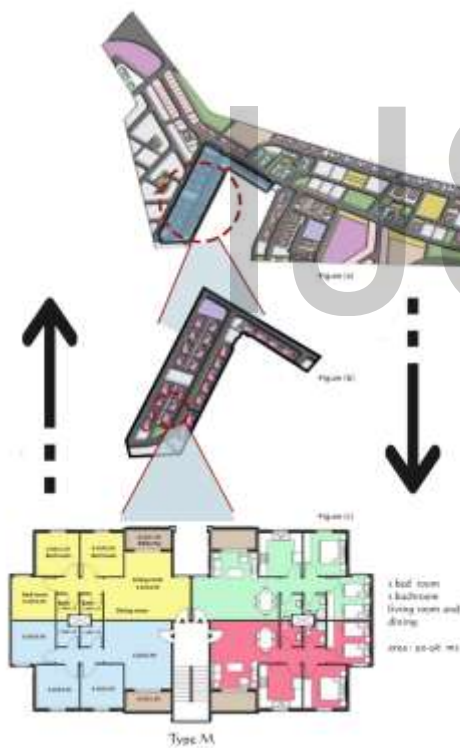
(a) Master Plan Residential Apartments, Abu-Alanda, East Amman / (b) Block Plan of the Type of Apartment (M) / (c) Architectural plan of a residential apartment for low-income people type (M).
